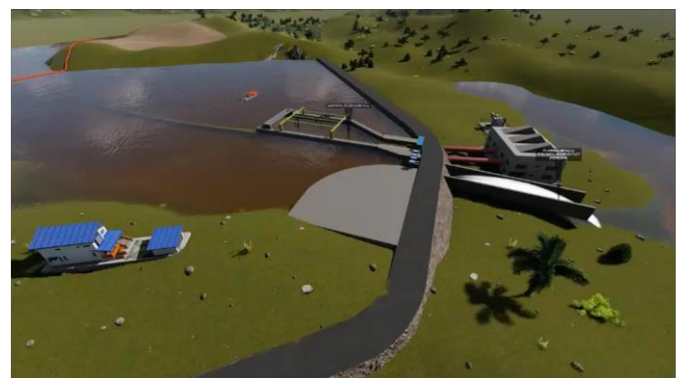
Illustration of Pond Structure Plan and Additional Guide Wall at Sengguruh Hydropower Intake Area
